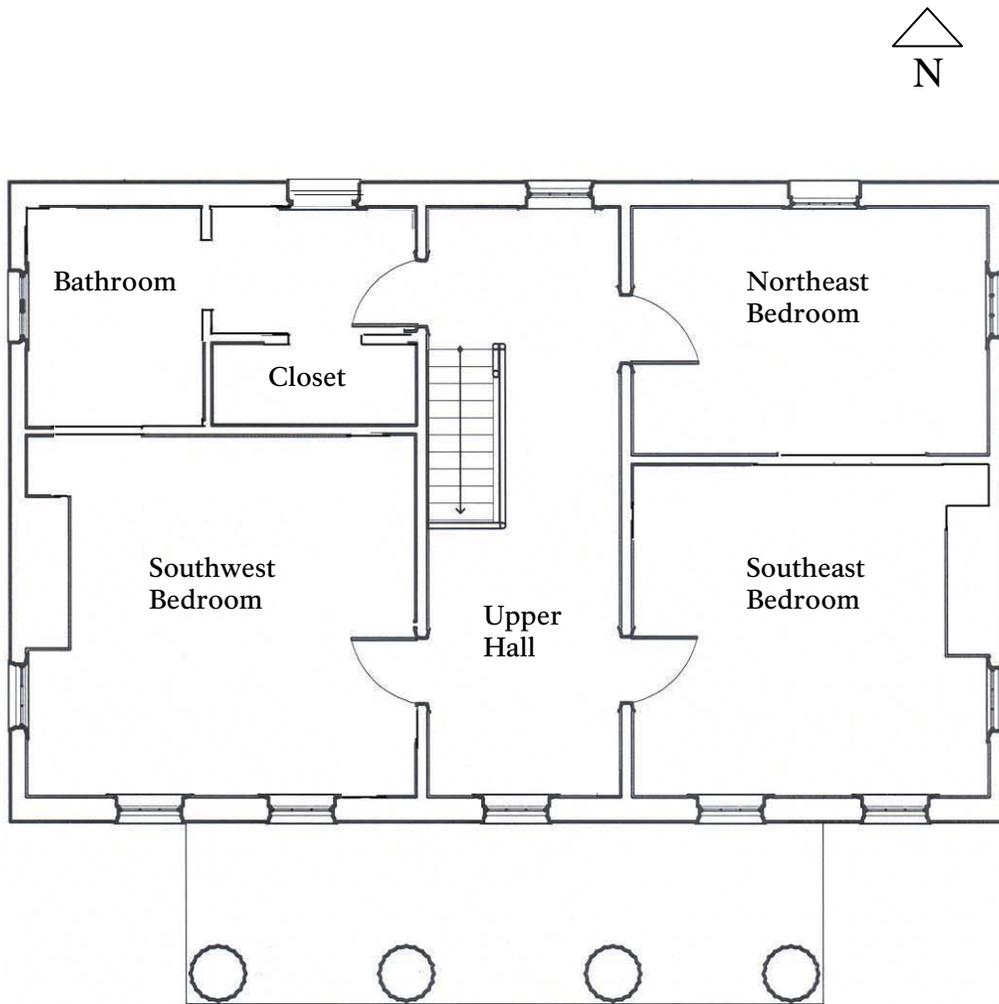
Conjectural second floor plan of the Hunt House, circa 1920. Not to scale.
